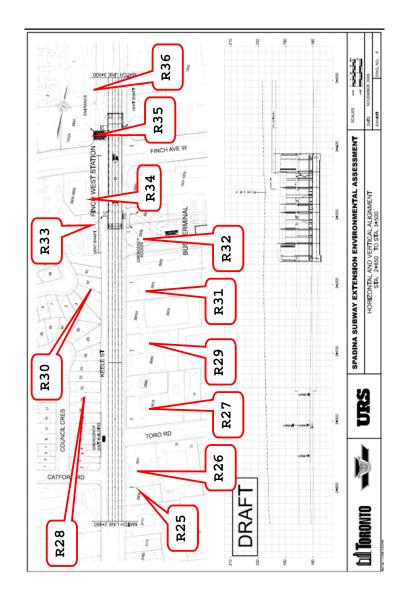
PLAN AND PROFILE OF THE PROPOSED SUBWAY ALIGNMENT
